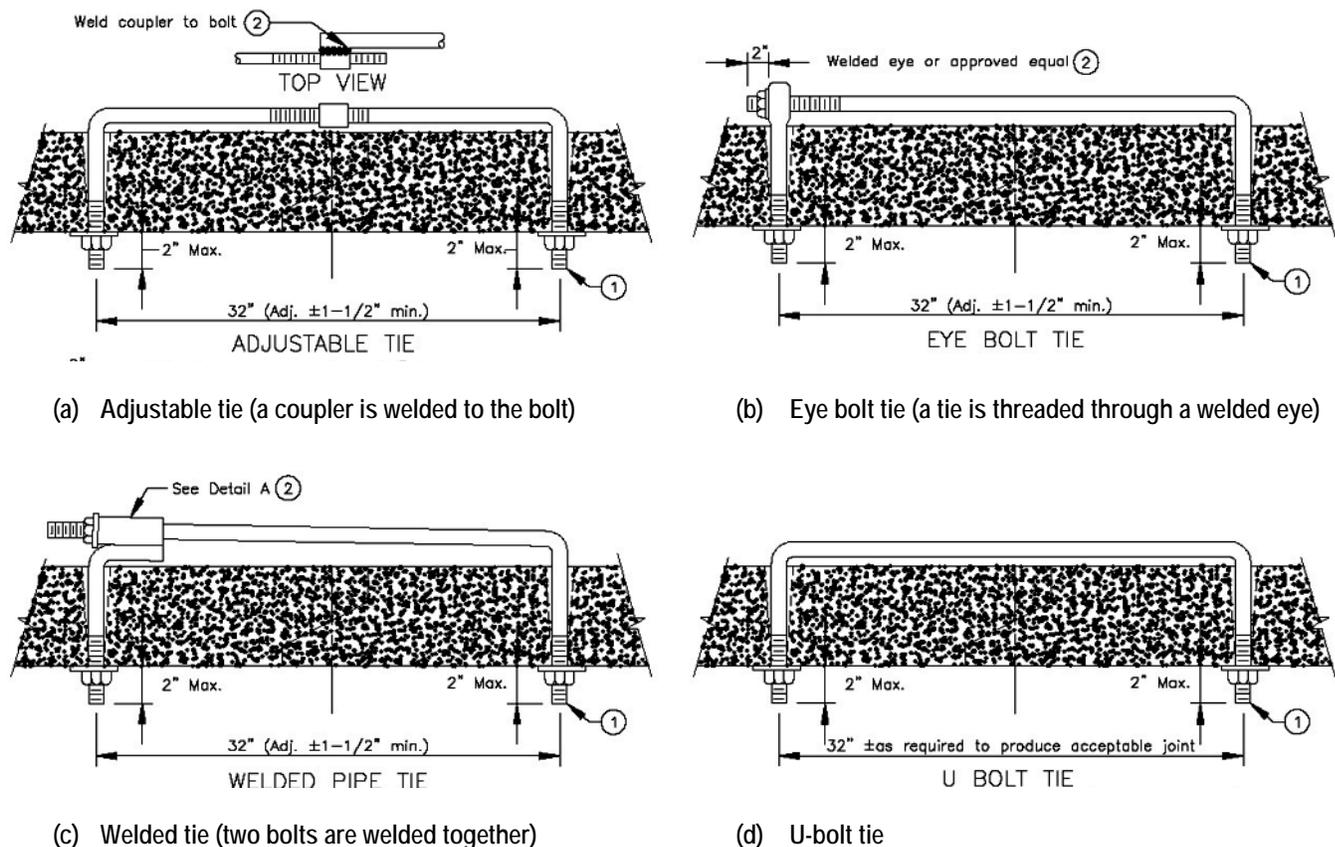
Four methods that can be used to attach concrete pipe ties in new culverts (MNDOT, 1985)
